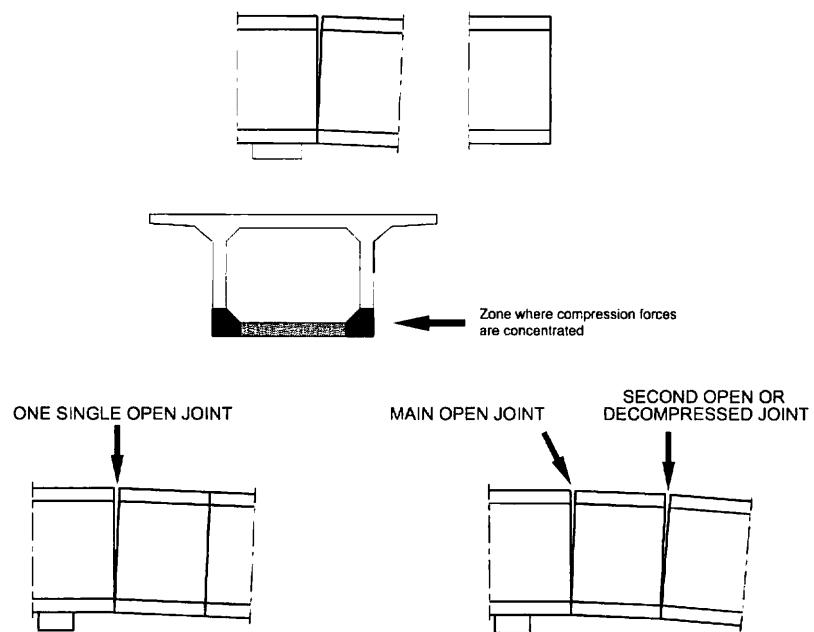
Reinforcement in joints adjacent to supports to produce local ductility
